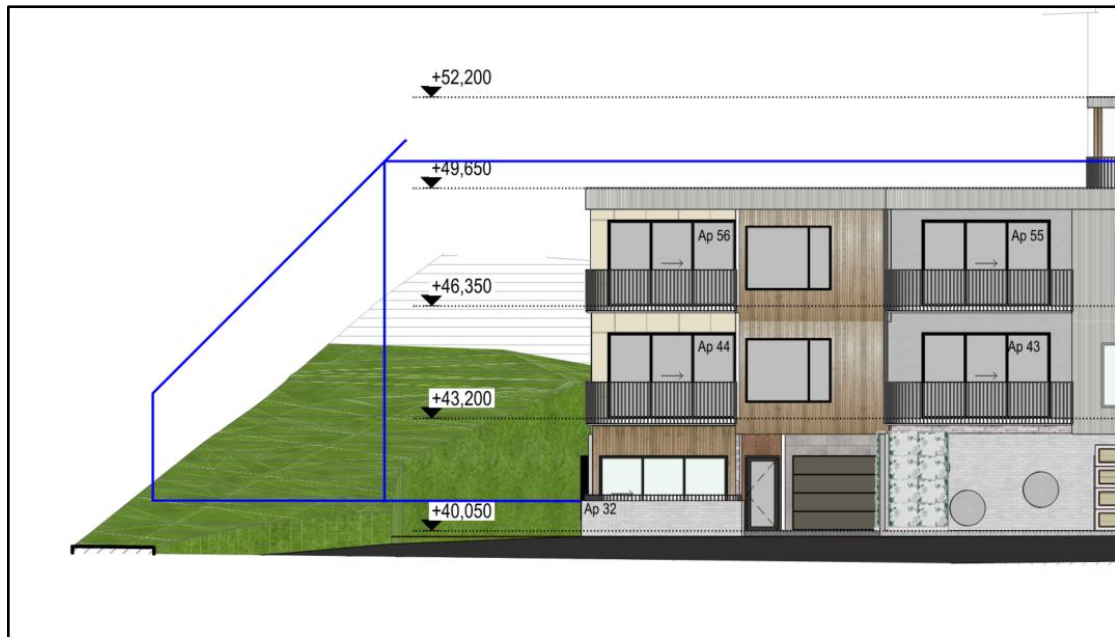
West elevation relative to building envelope determined by the Northern side boundary adjoining 19 and 20 Fairfax Street. Note this section is at a lower AHD than the roof terrace shown behind the façade.
